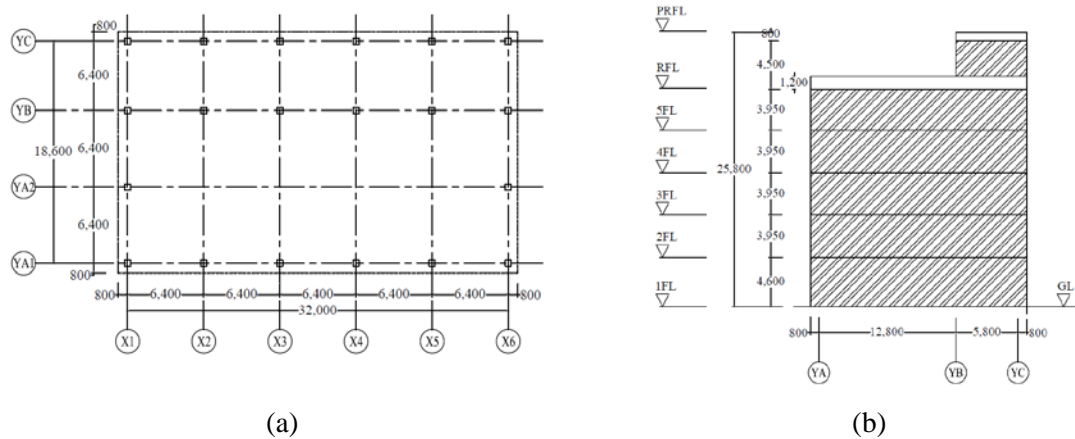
(a) Plan view of the building; and (b) side view of the building.
